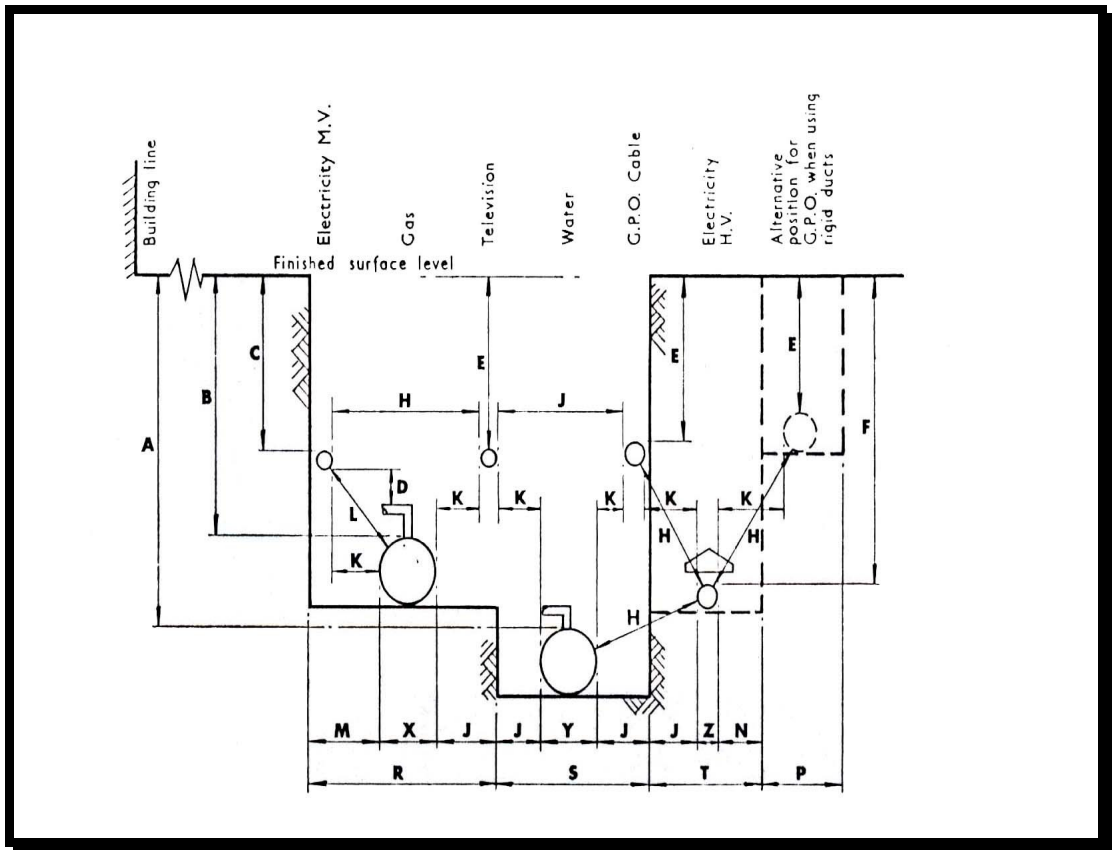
Proposed cross-section of a joint trench for housing estate distribution
